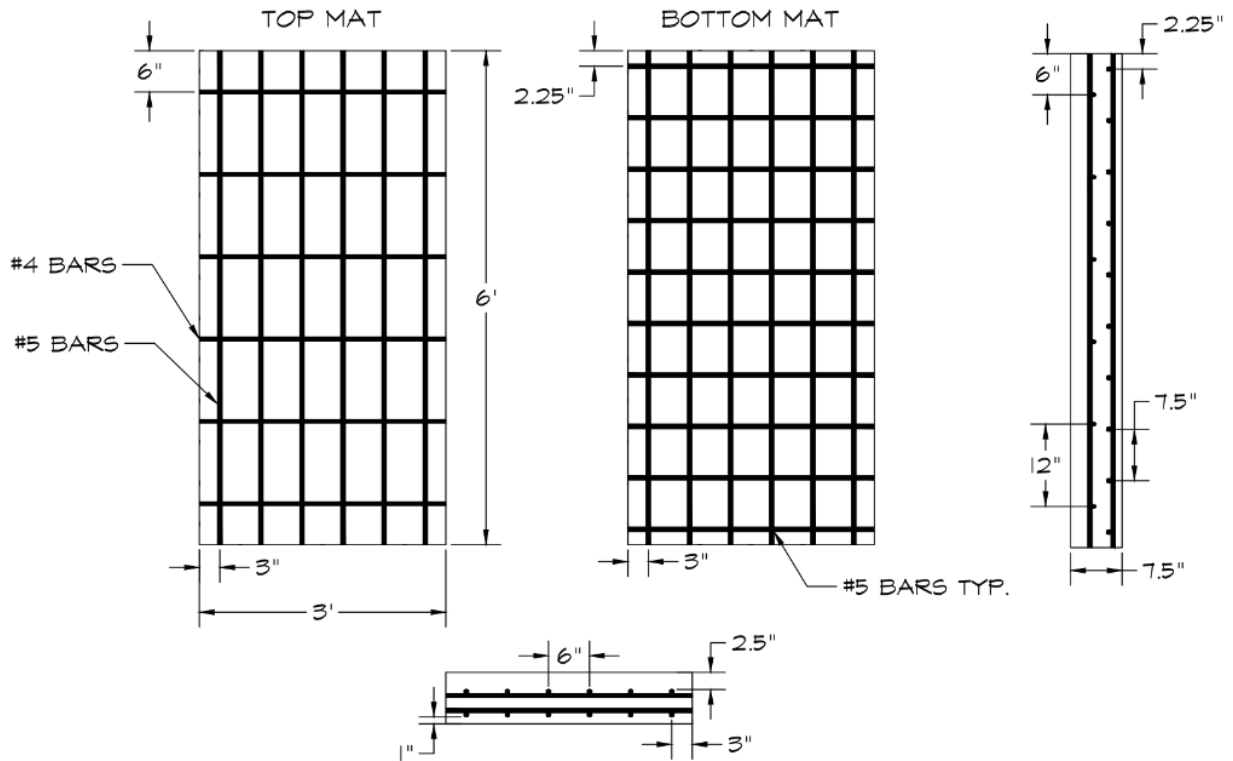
Reinforcement layout of the mini-bridge deck substrates (Guerrero-Estrada, 2024)
